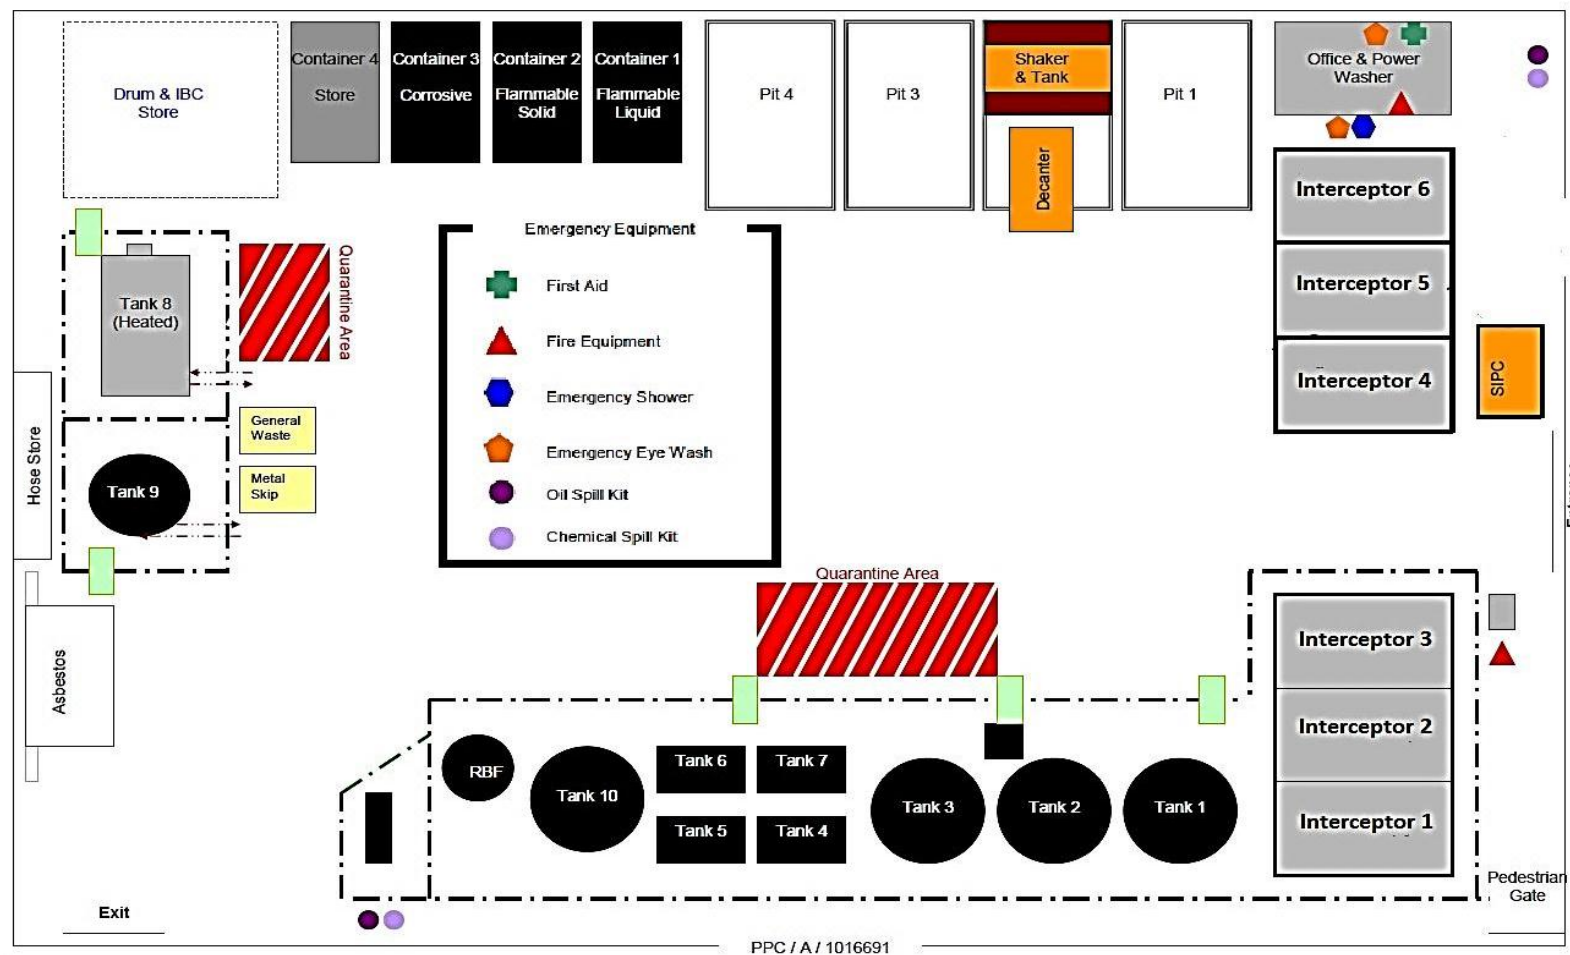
the Sureclean Alness Waste Transfer Station Site Plan.
